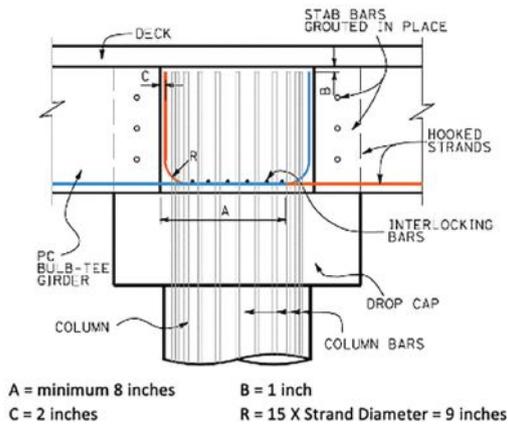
Draft details from Caltrans for accelerated bridge construction of a precast concrete girder-to-bent cap connection using extended, hooked strands for continuity.
